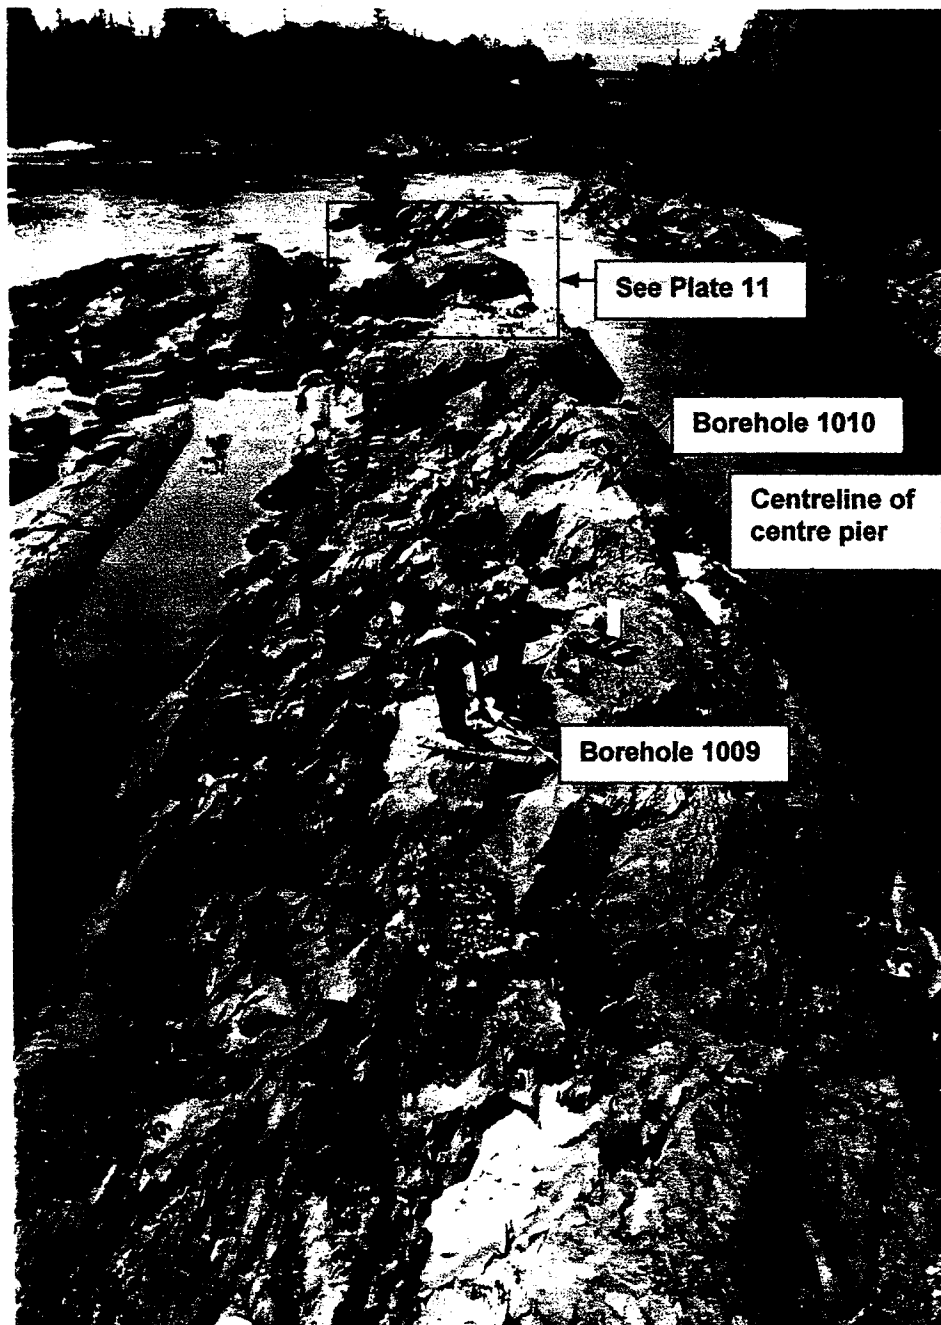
Looking west from existing bridge deck at location of new centre pier. Coring at borehole 1009. Note jagged character of exposed rock surface.
